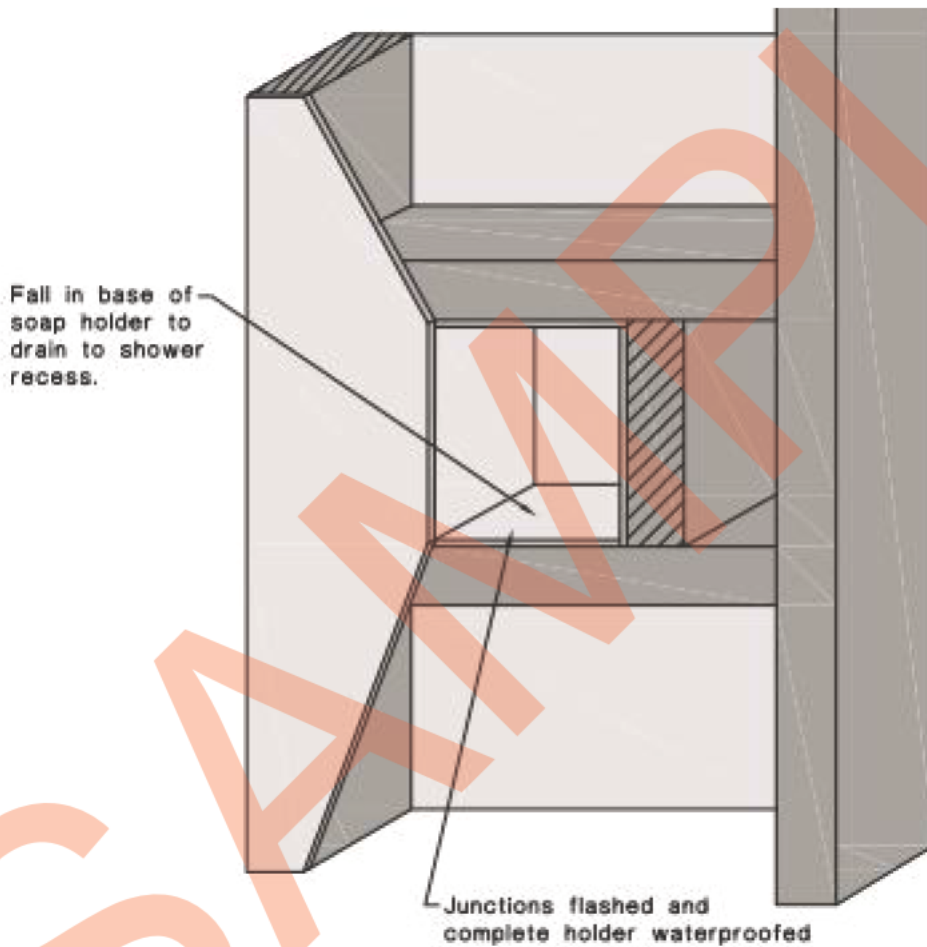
TYPICAL DETAIL FOR RECESSED SOAP HOLDERS
